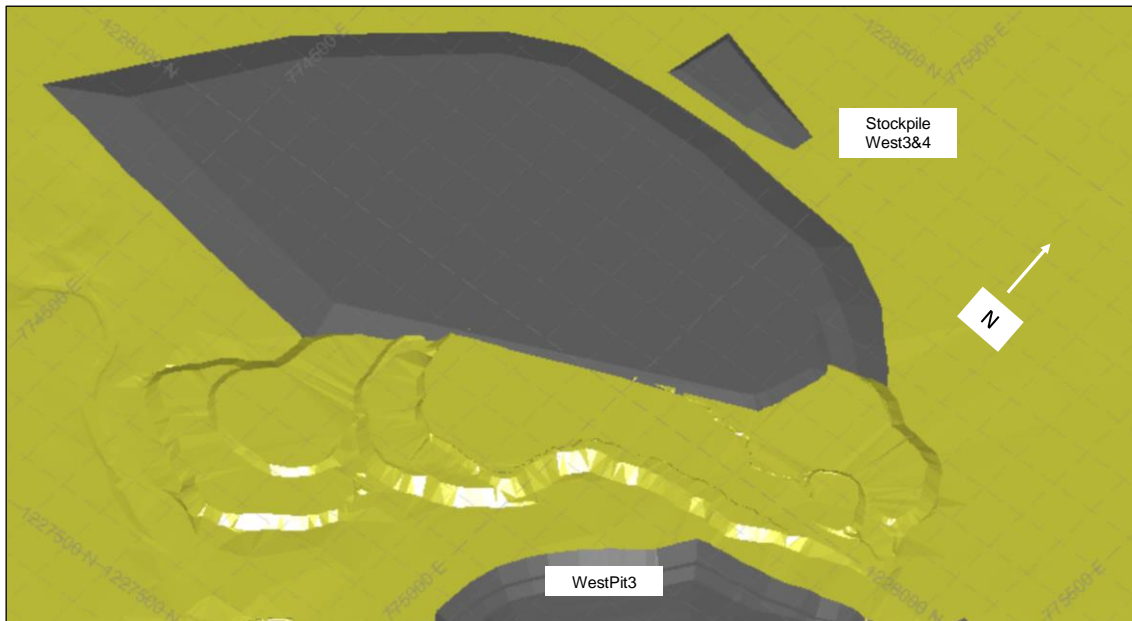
Youga – West Pit 3 and West Pit 4 waste dump and stockpile designs (2017)
